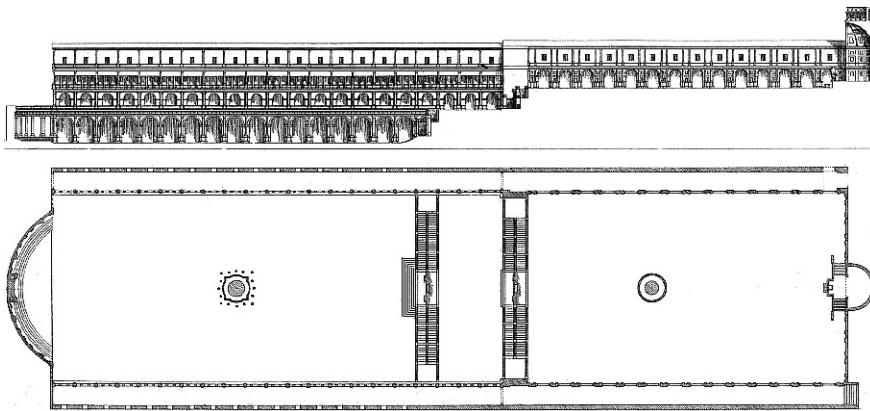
Belvedere plan and side elevation (Image: <http://quondam.com>)
